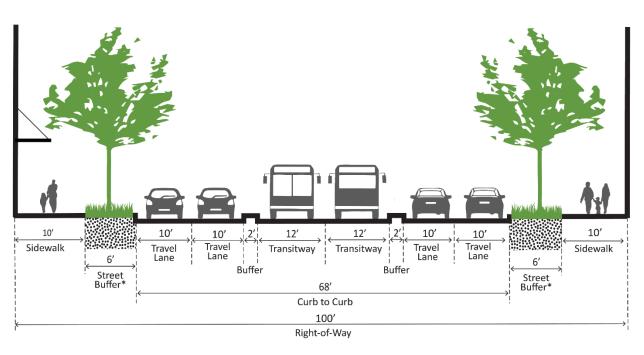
Colesville Road (M-10): North Noyes Drive to Spring Street, Looking North
